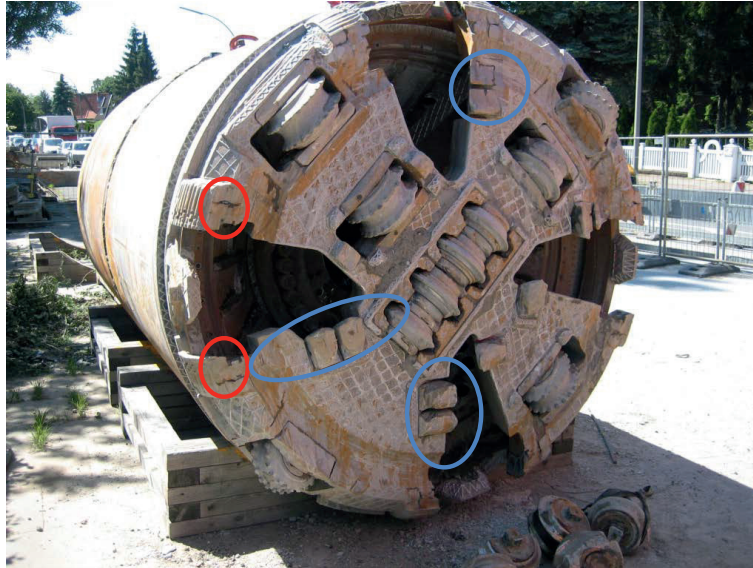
Worn-out pipe-jacking slurry shield cutter head and tools from the Sammler Ost project in Hamburg. The TBM diameter is 2.24 m. Red circles show fractures (secondary wear) in the cutter head. The contractor failed to replace the excavation tools in time. Blue circles show worn-out ripper tools resulting from abrasive wear (primary wear). Photo by Tim E. E. Becker.
